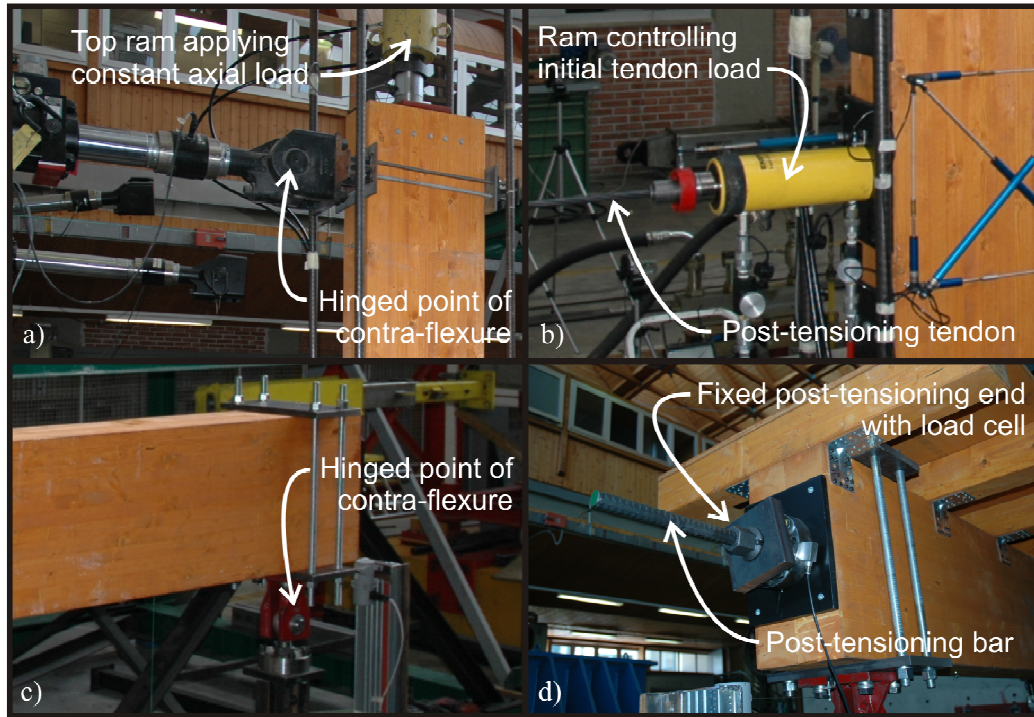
a) Top ram for displacement application, b) ram for tendon load (showing tensioned tendon) c) beam hold-down hinge and d) beam post-tension end connection (showing tensioned bar)
